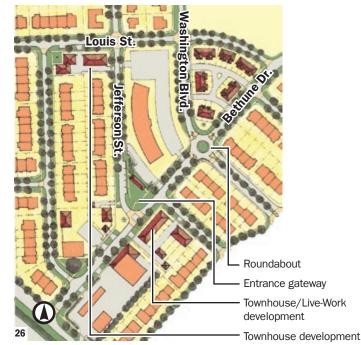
Detail plan of the area around the Florida Turnpike ramp and Bethune Drive
